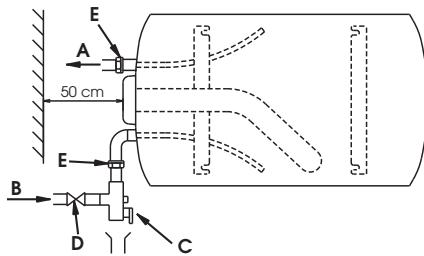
Horizontal element on the protection element - supply pipes on the right-hand side
